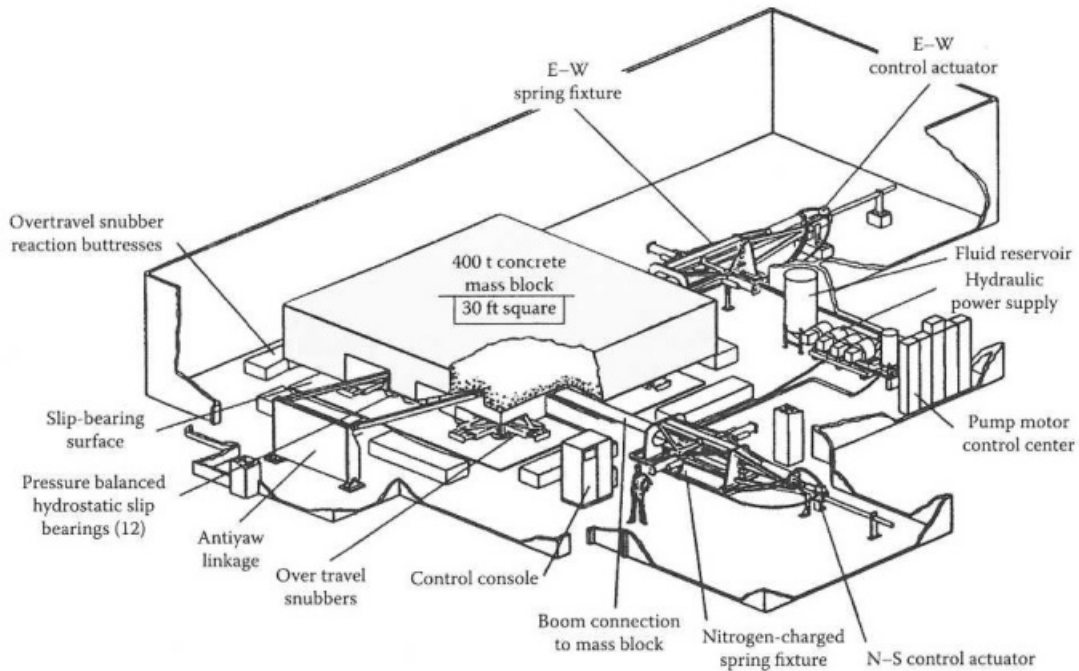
The tuned mass damper arrangement of Citicorp Center in New York [21]
